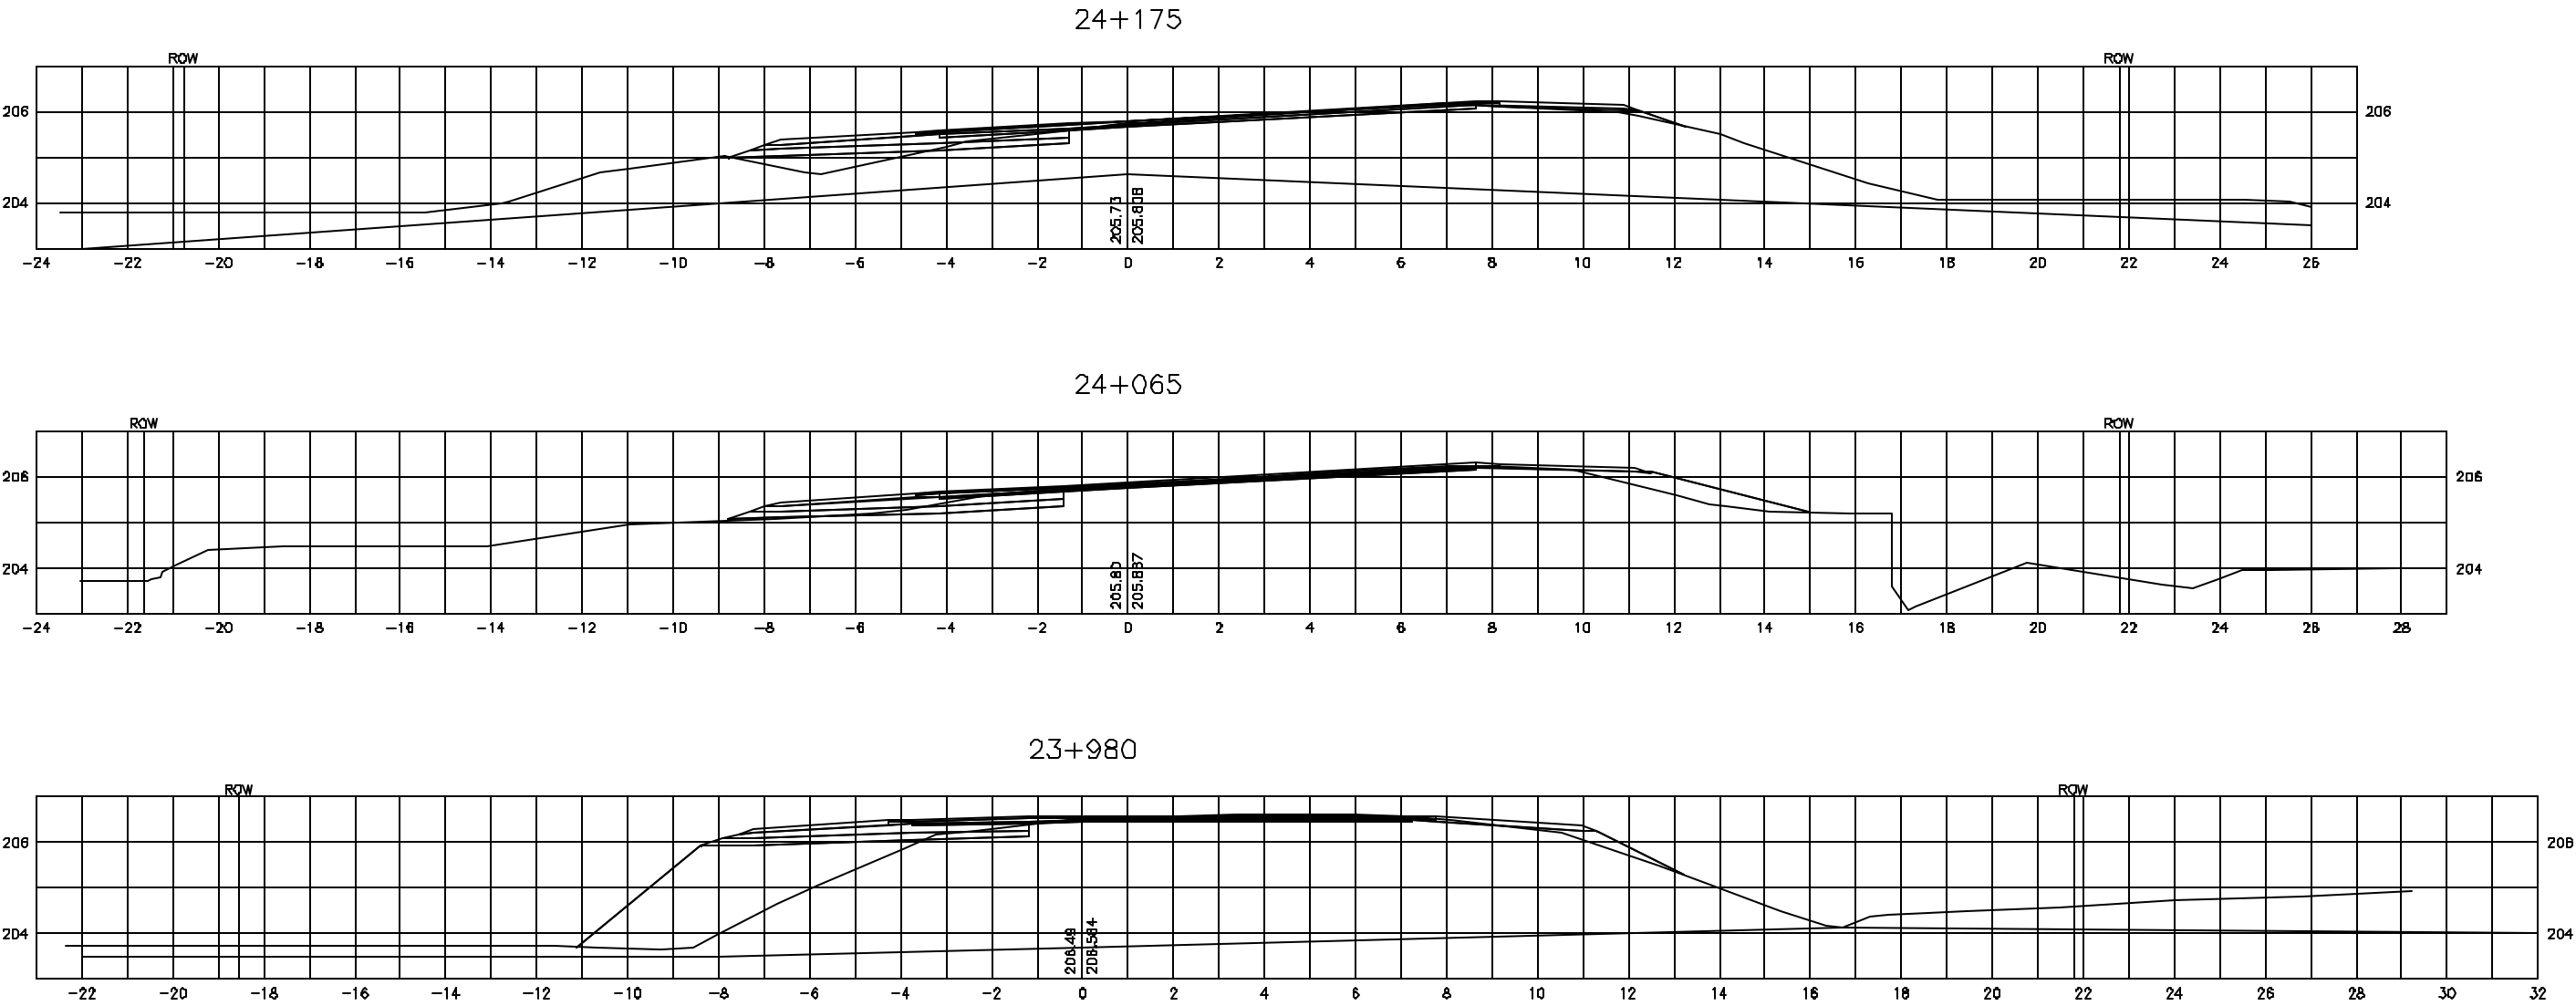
Typical Proposed Cross-Sections for Swamp No. 2
